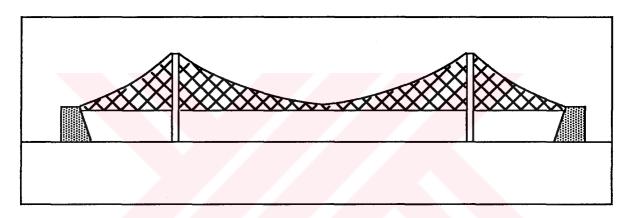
SUSPENSION SYSTEM WITH A HANGER NET BETWEEN THE MAIN CABLE AND THE STIFFENING GIRDER
